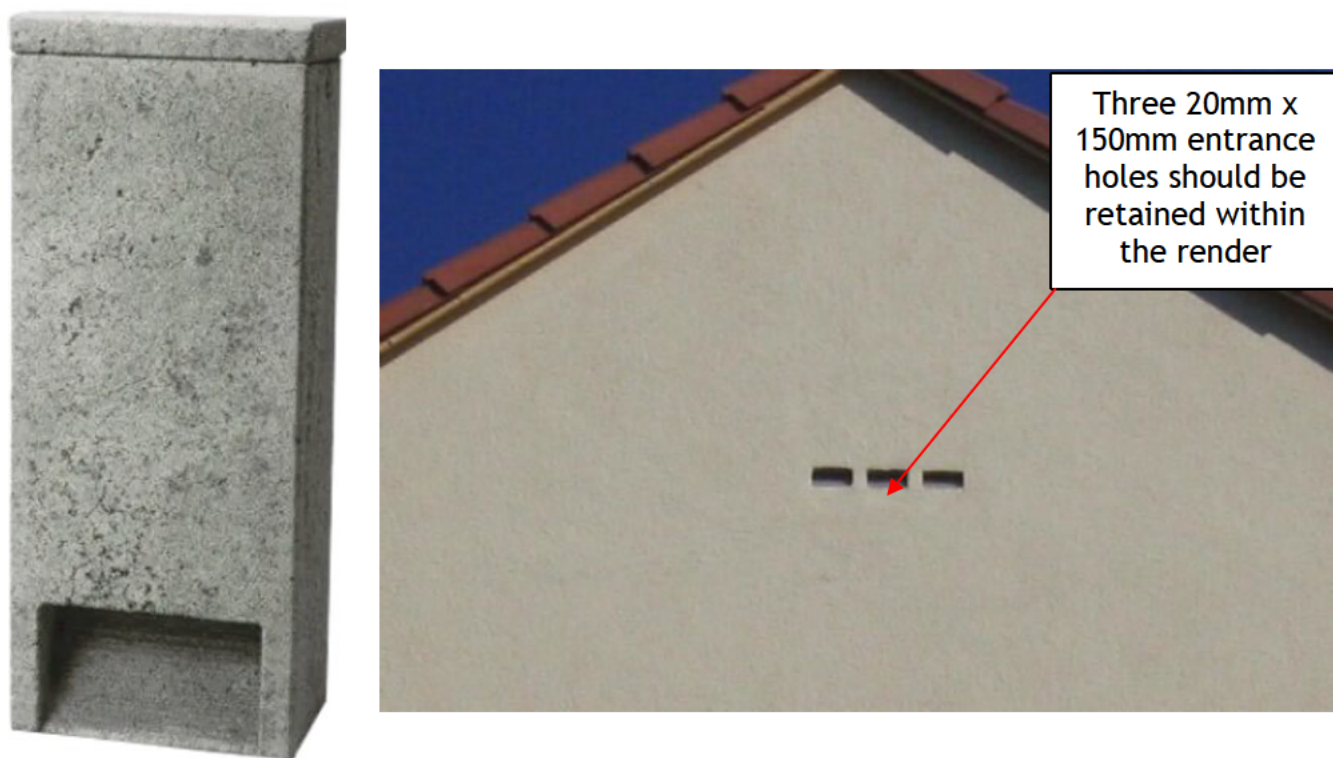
1FR Schwegler woodstone bat box (L) to be concealed behind render to Units 1, 9, 72, 73 and 74
